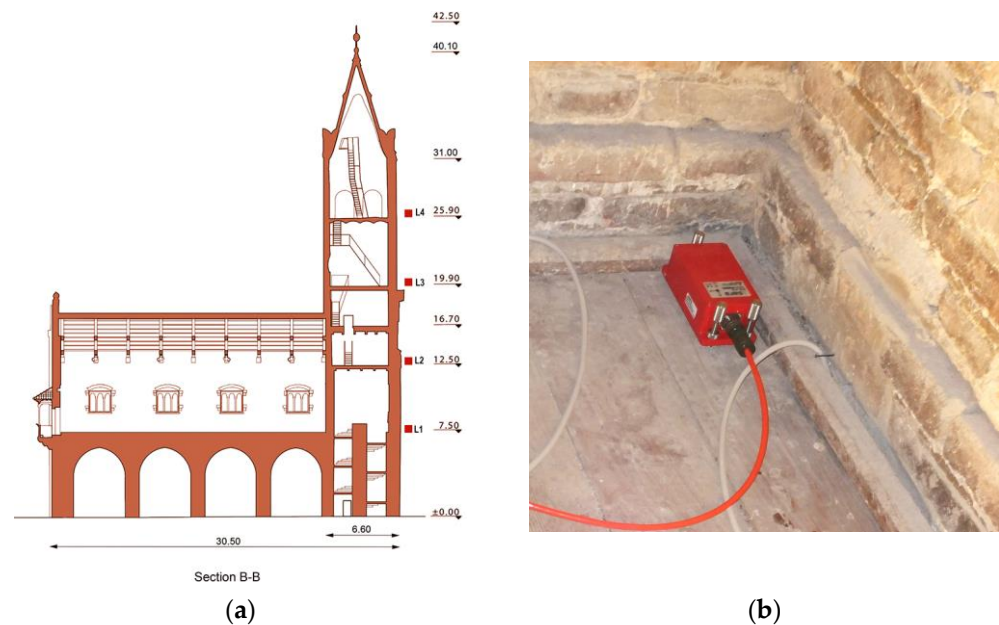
Instrumented cross-sections (a) and sensors (b) used during the tests.
